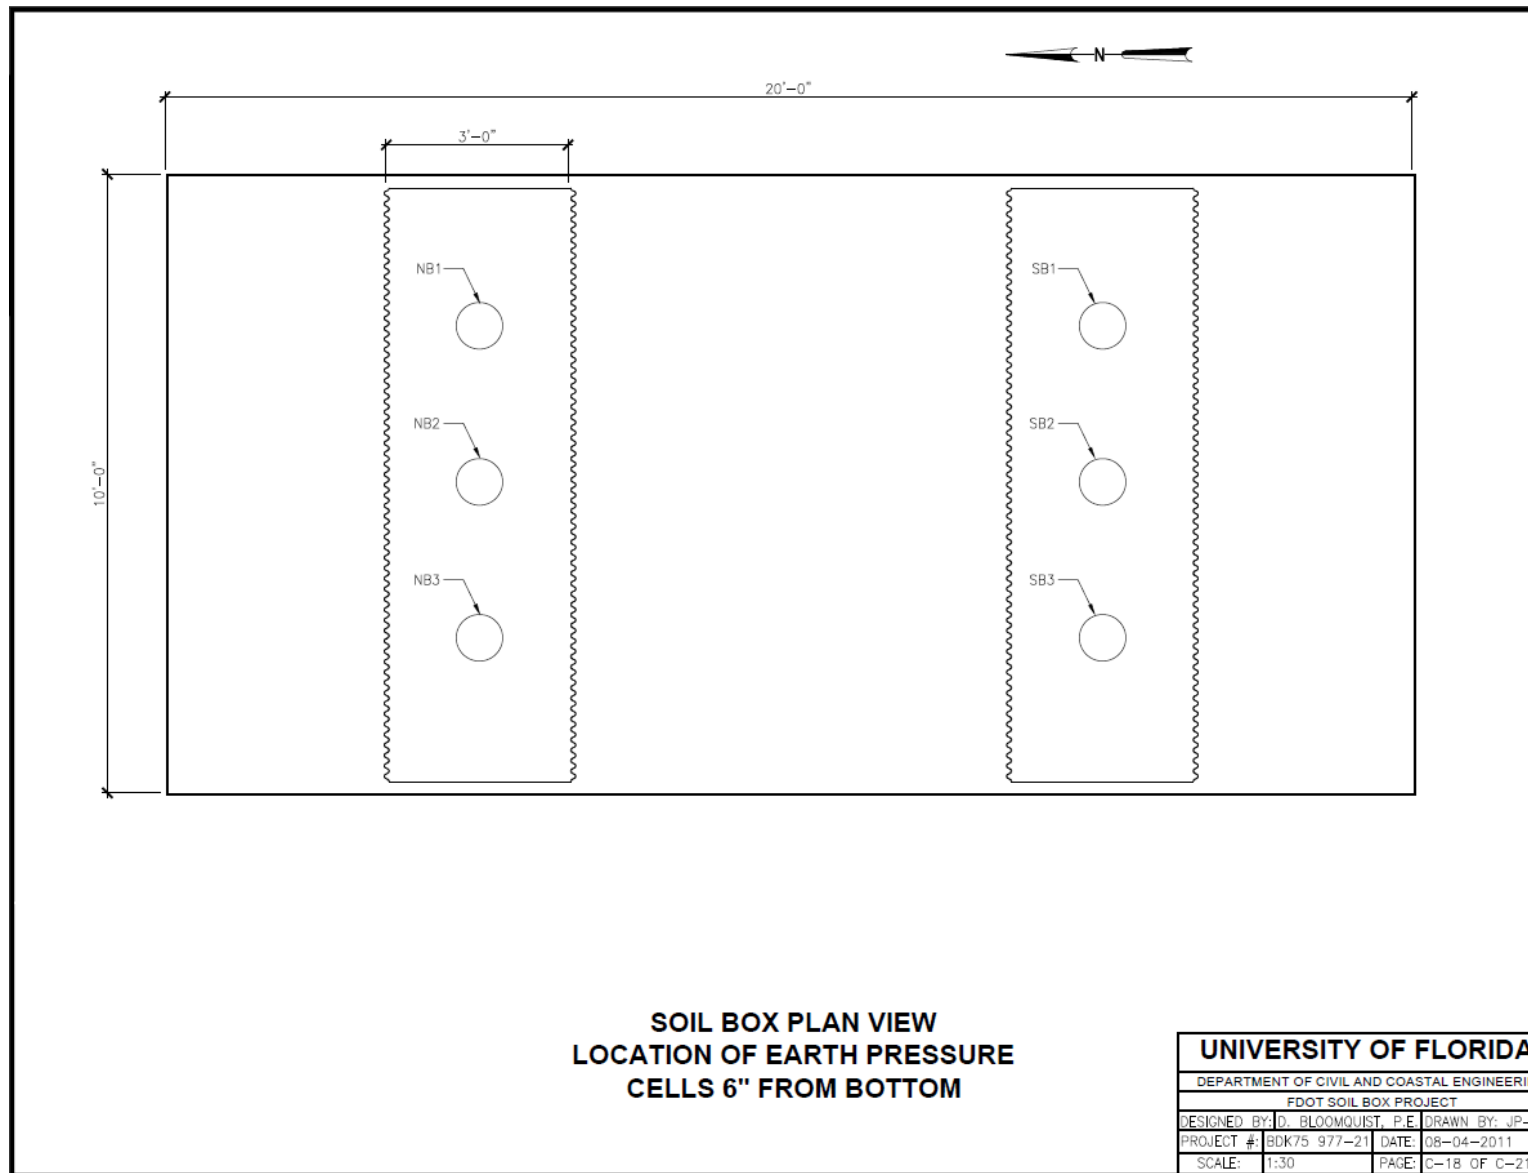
Earth pressure cell layout for steel pipe test 6" from bottom of Soil Box.
